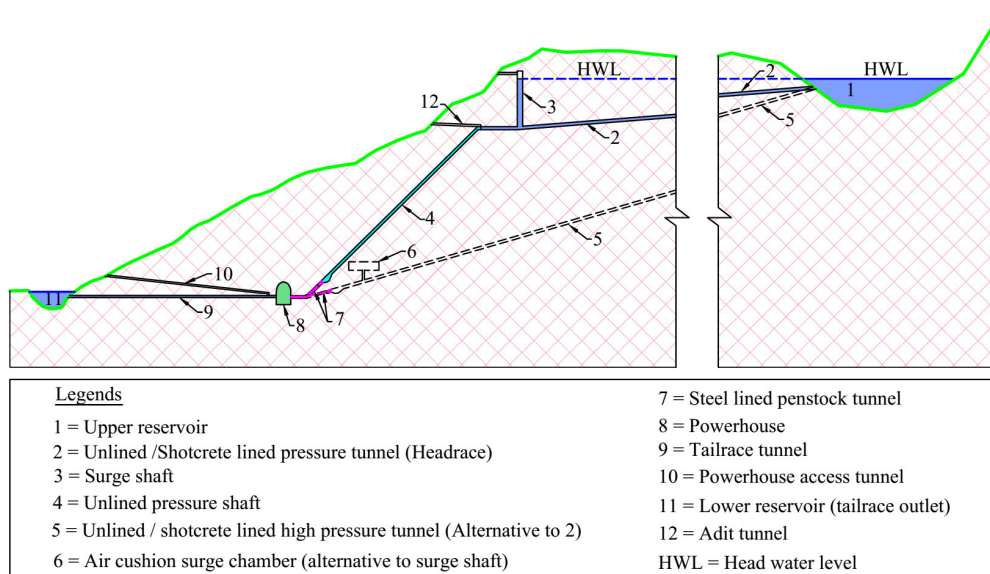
A typical layout of underground hydropower scheme with unlined pressure shaft and tunnel
